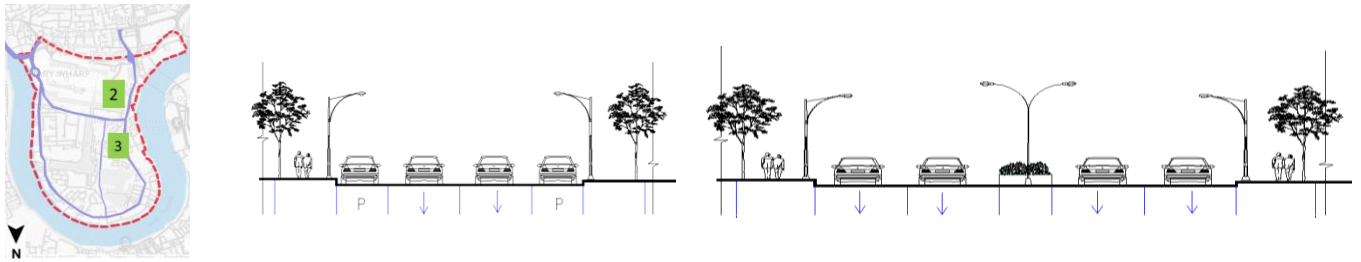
Existing Sub-Arterial Road Plan & Section (Source: Author)
